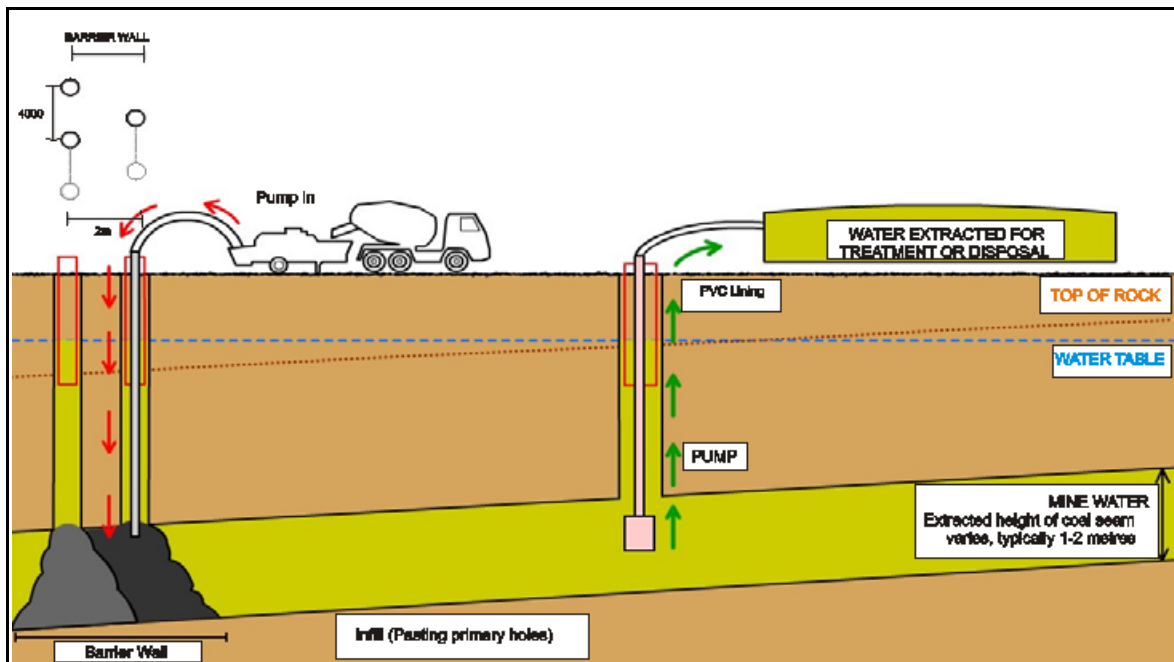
Initial construction of the barrier wall and water extraction. Modified after Millar and Holz (2010).
